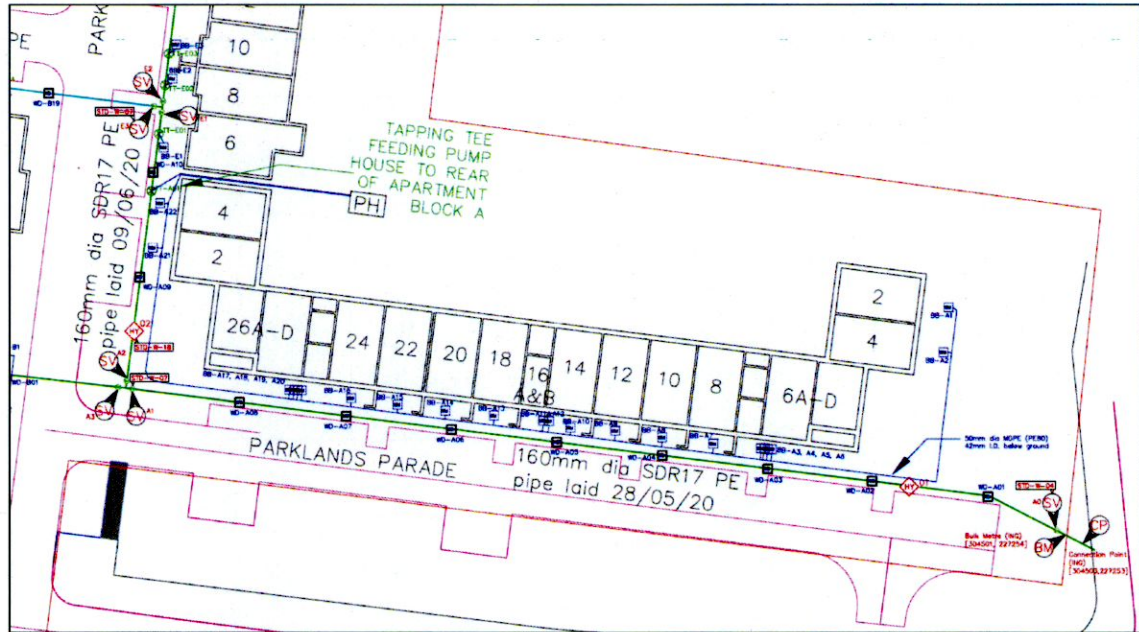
Water distribution layout serving duplexes [Extract from as-built drawings]
